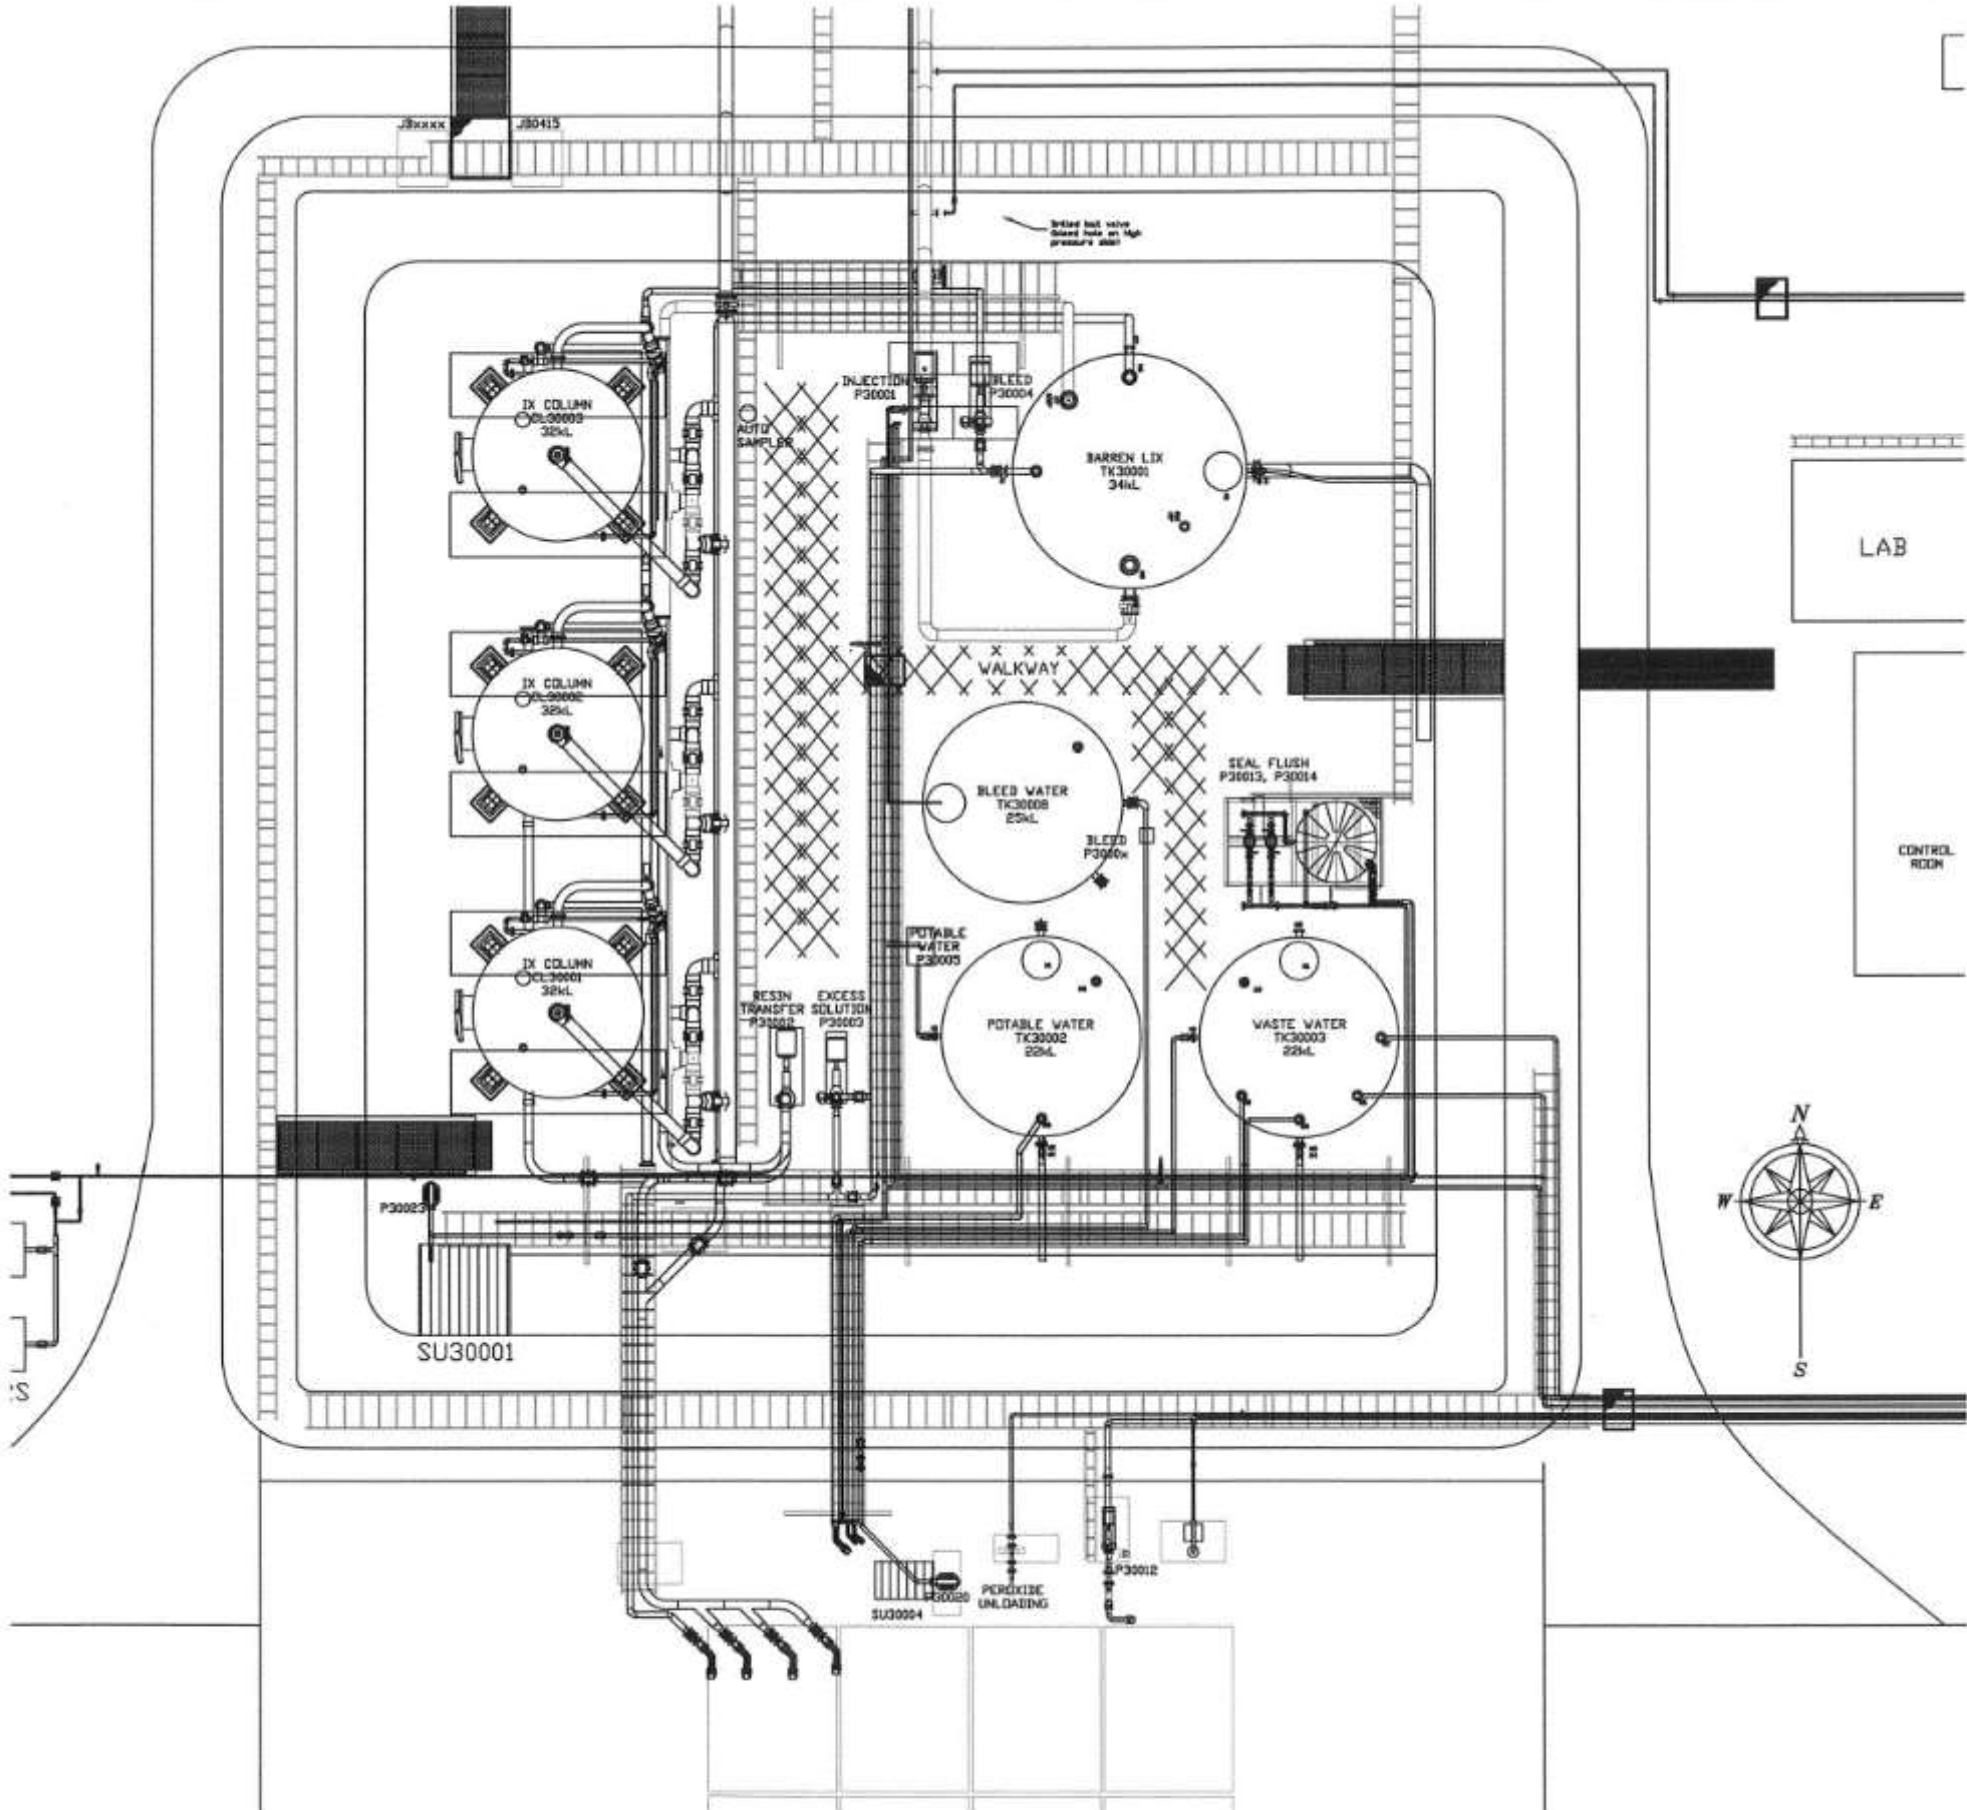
Pepegoona Satellite Plant Site Layout – bunded plant area
